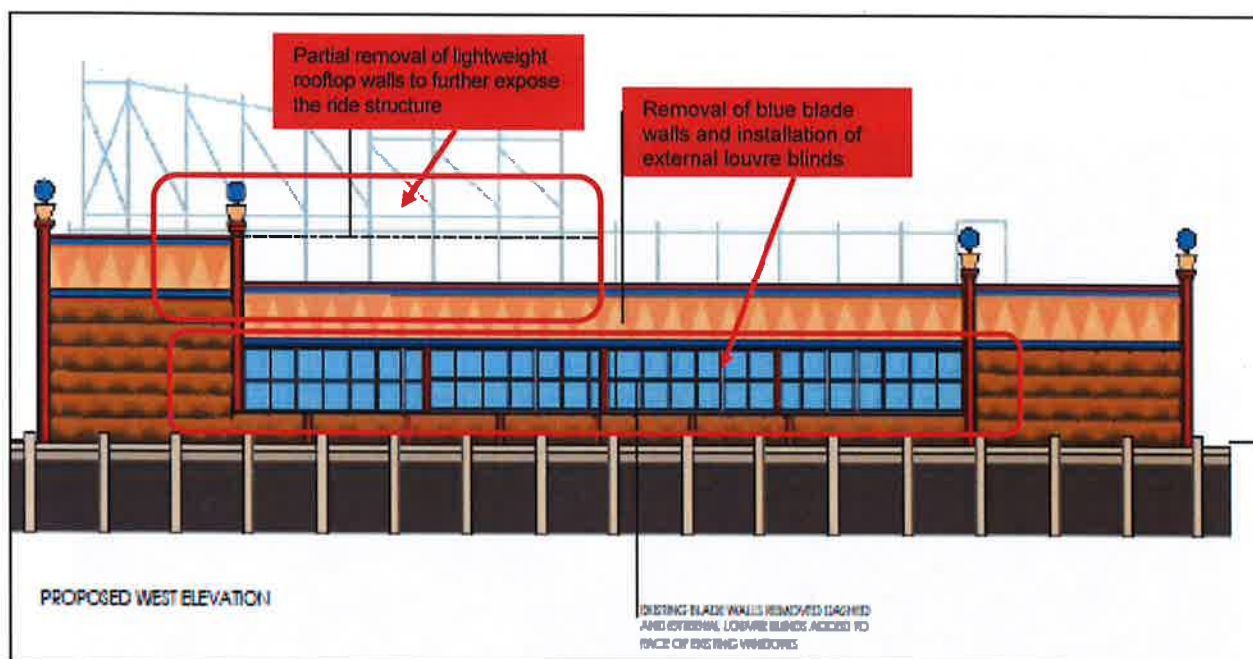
Proposed western façade (Source: Applicant's architectural drawings)
